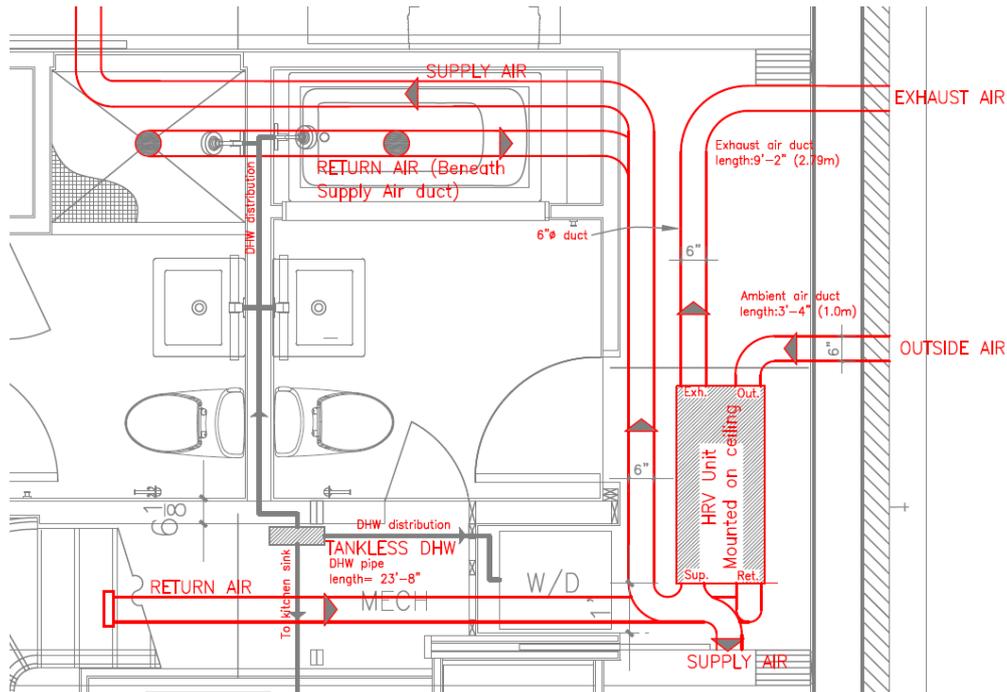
Ventilation duct plan – detail (shown turned 90 degrees)
